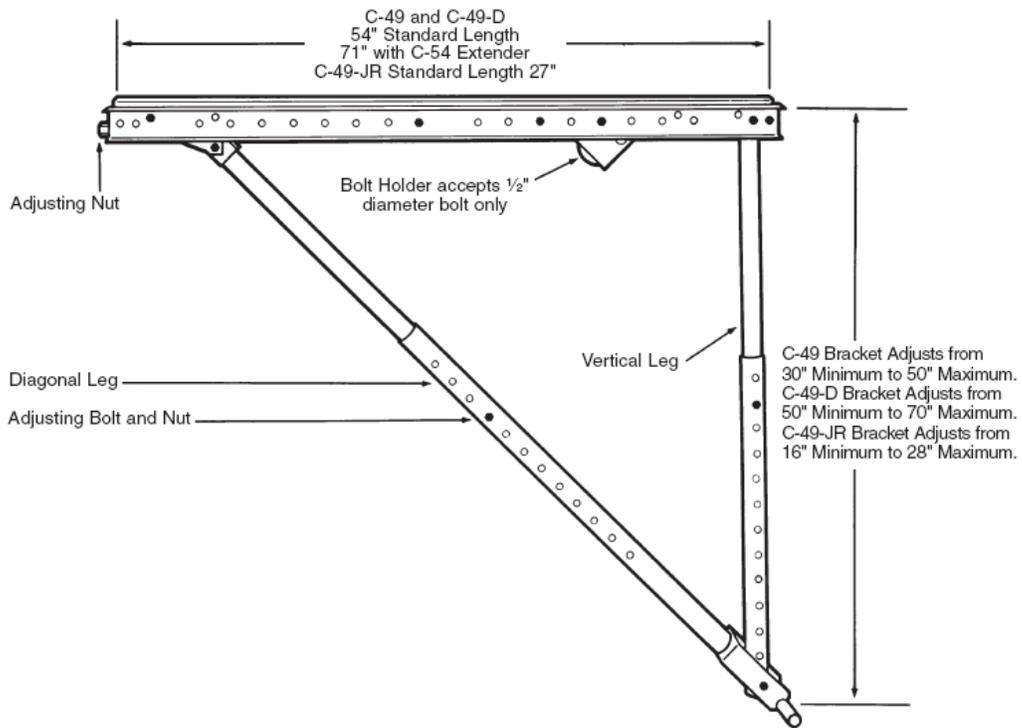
Diagram of C-49 Bridge Overhang Bracket(Dayton Superior Bridge Deck Product Handbook, 2007)
